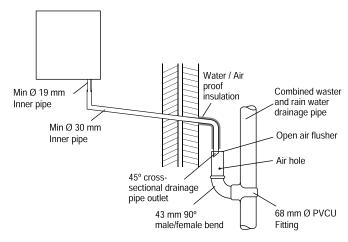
Connection of Condensate Drainage to Rain Water Drainage
